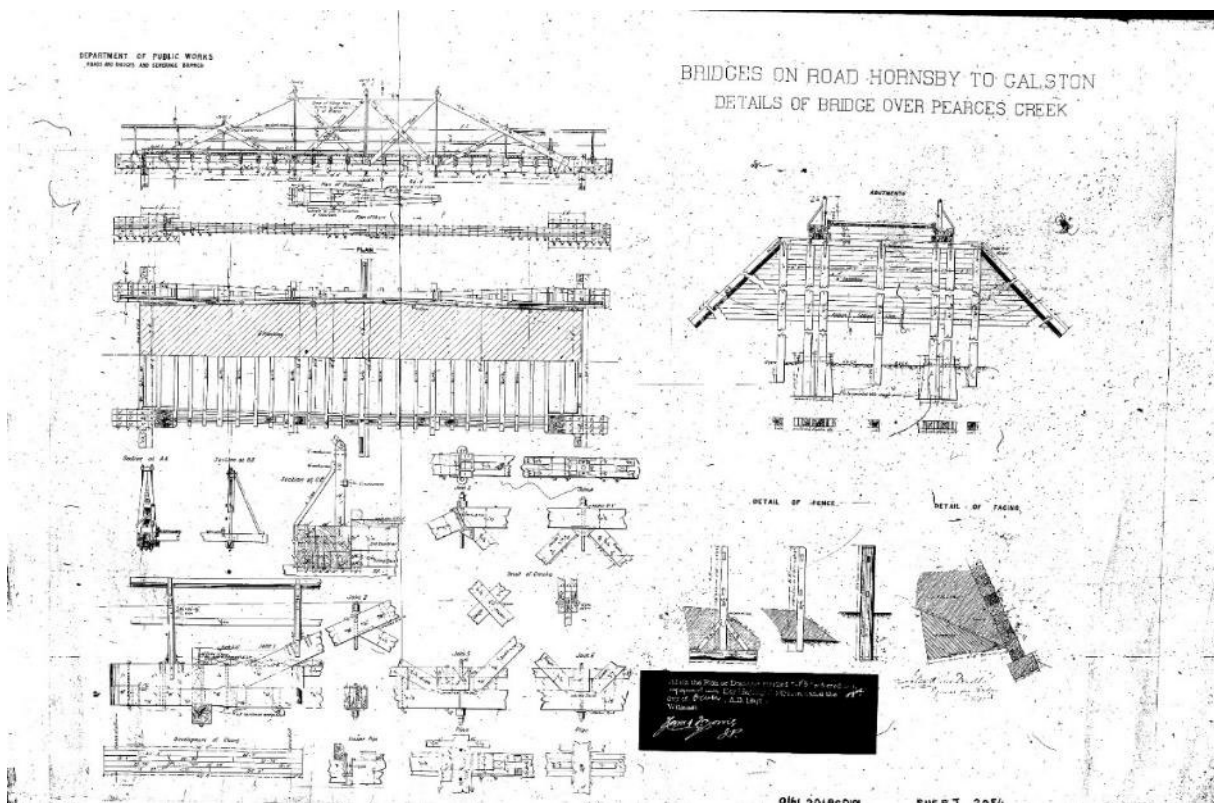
Details of Galston Timber Bridge, showing sections of the bridge abutments, fencing, planking and timber members. (Source: Bridges on Road Hornsby to Galston, Department of Public Works, Roads and Bridges and Sewerage Brand, c.1892. RTA 161.201.BC.0101)
